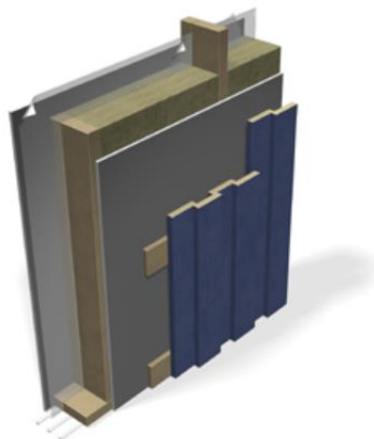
Frame with Timber Cladding or Brick façade (Paroc, 2021).
